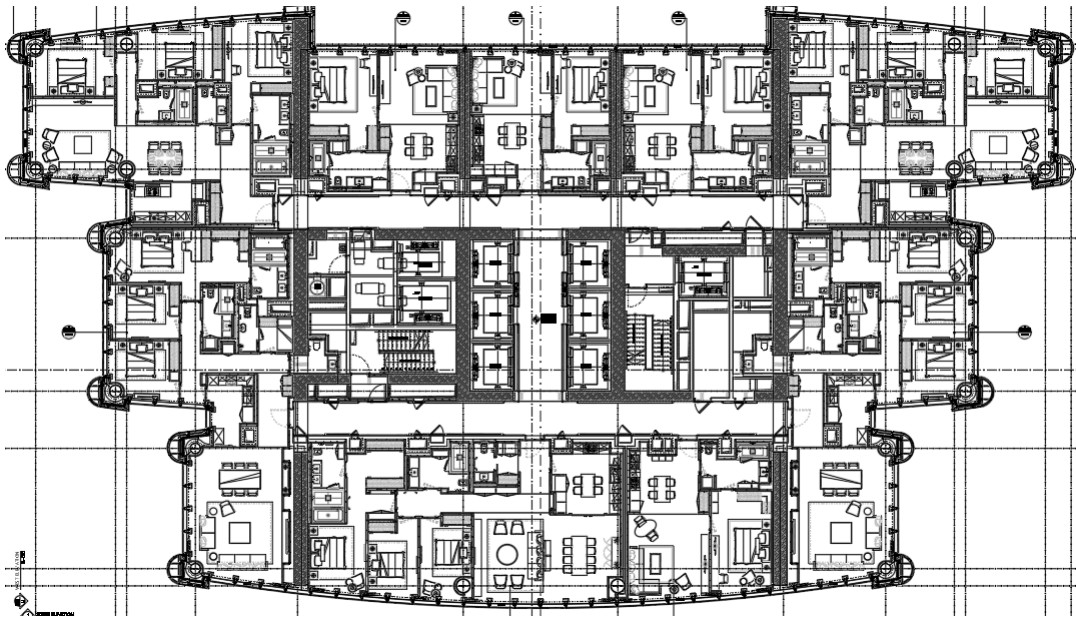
Architectural plan of floors 30 to 36 of Zone C.
